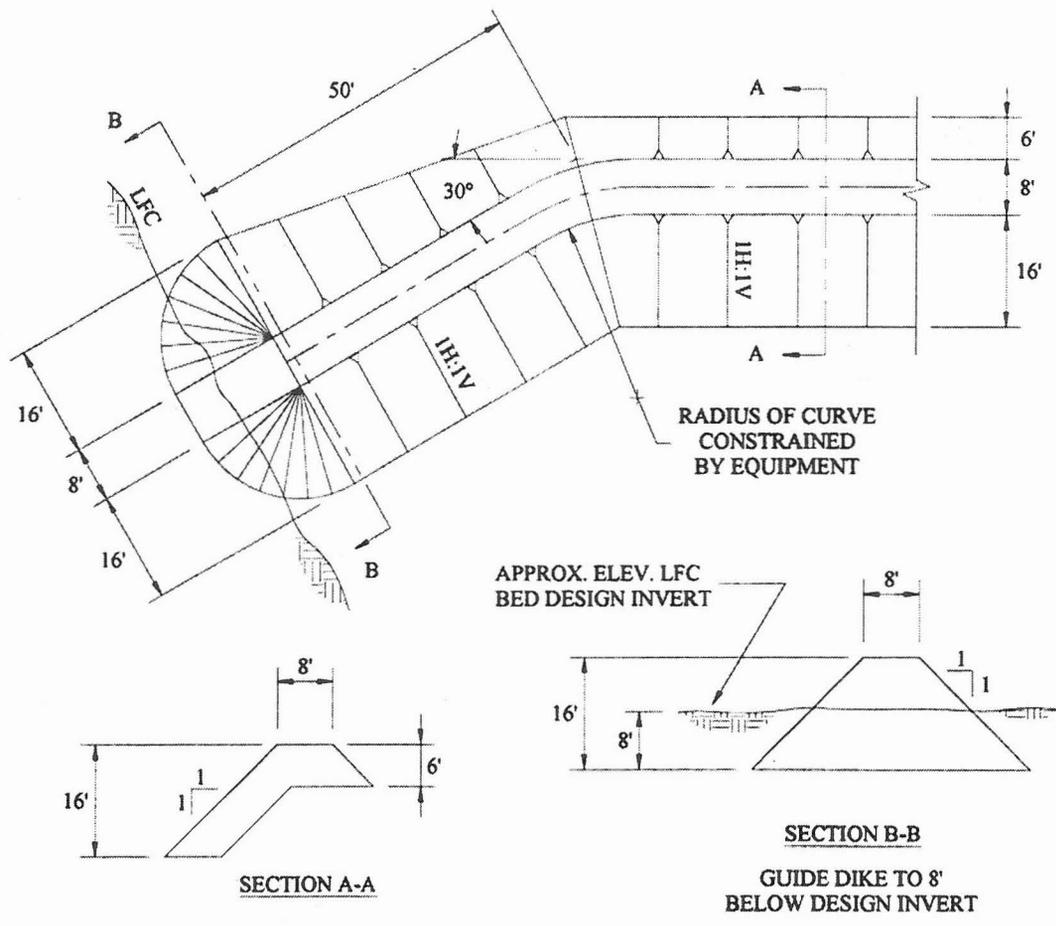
Plan view of revised guide dike design, end detail for low flow channel side.
